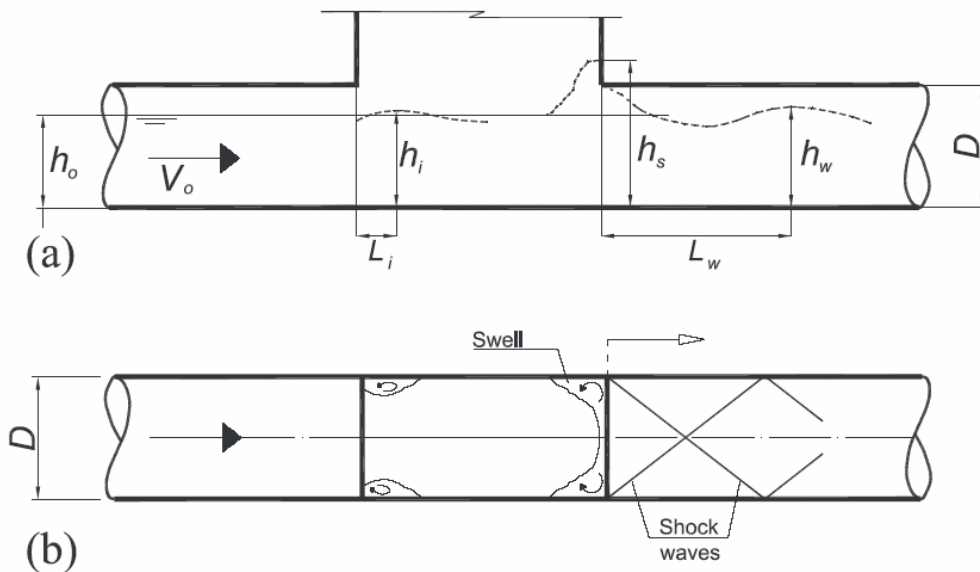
Through-flow manhole (a) Section, (b) Plan.
